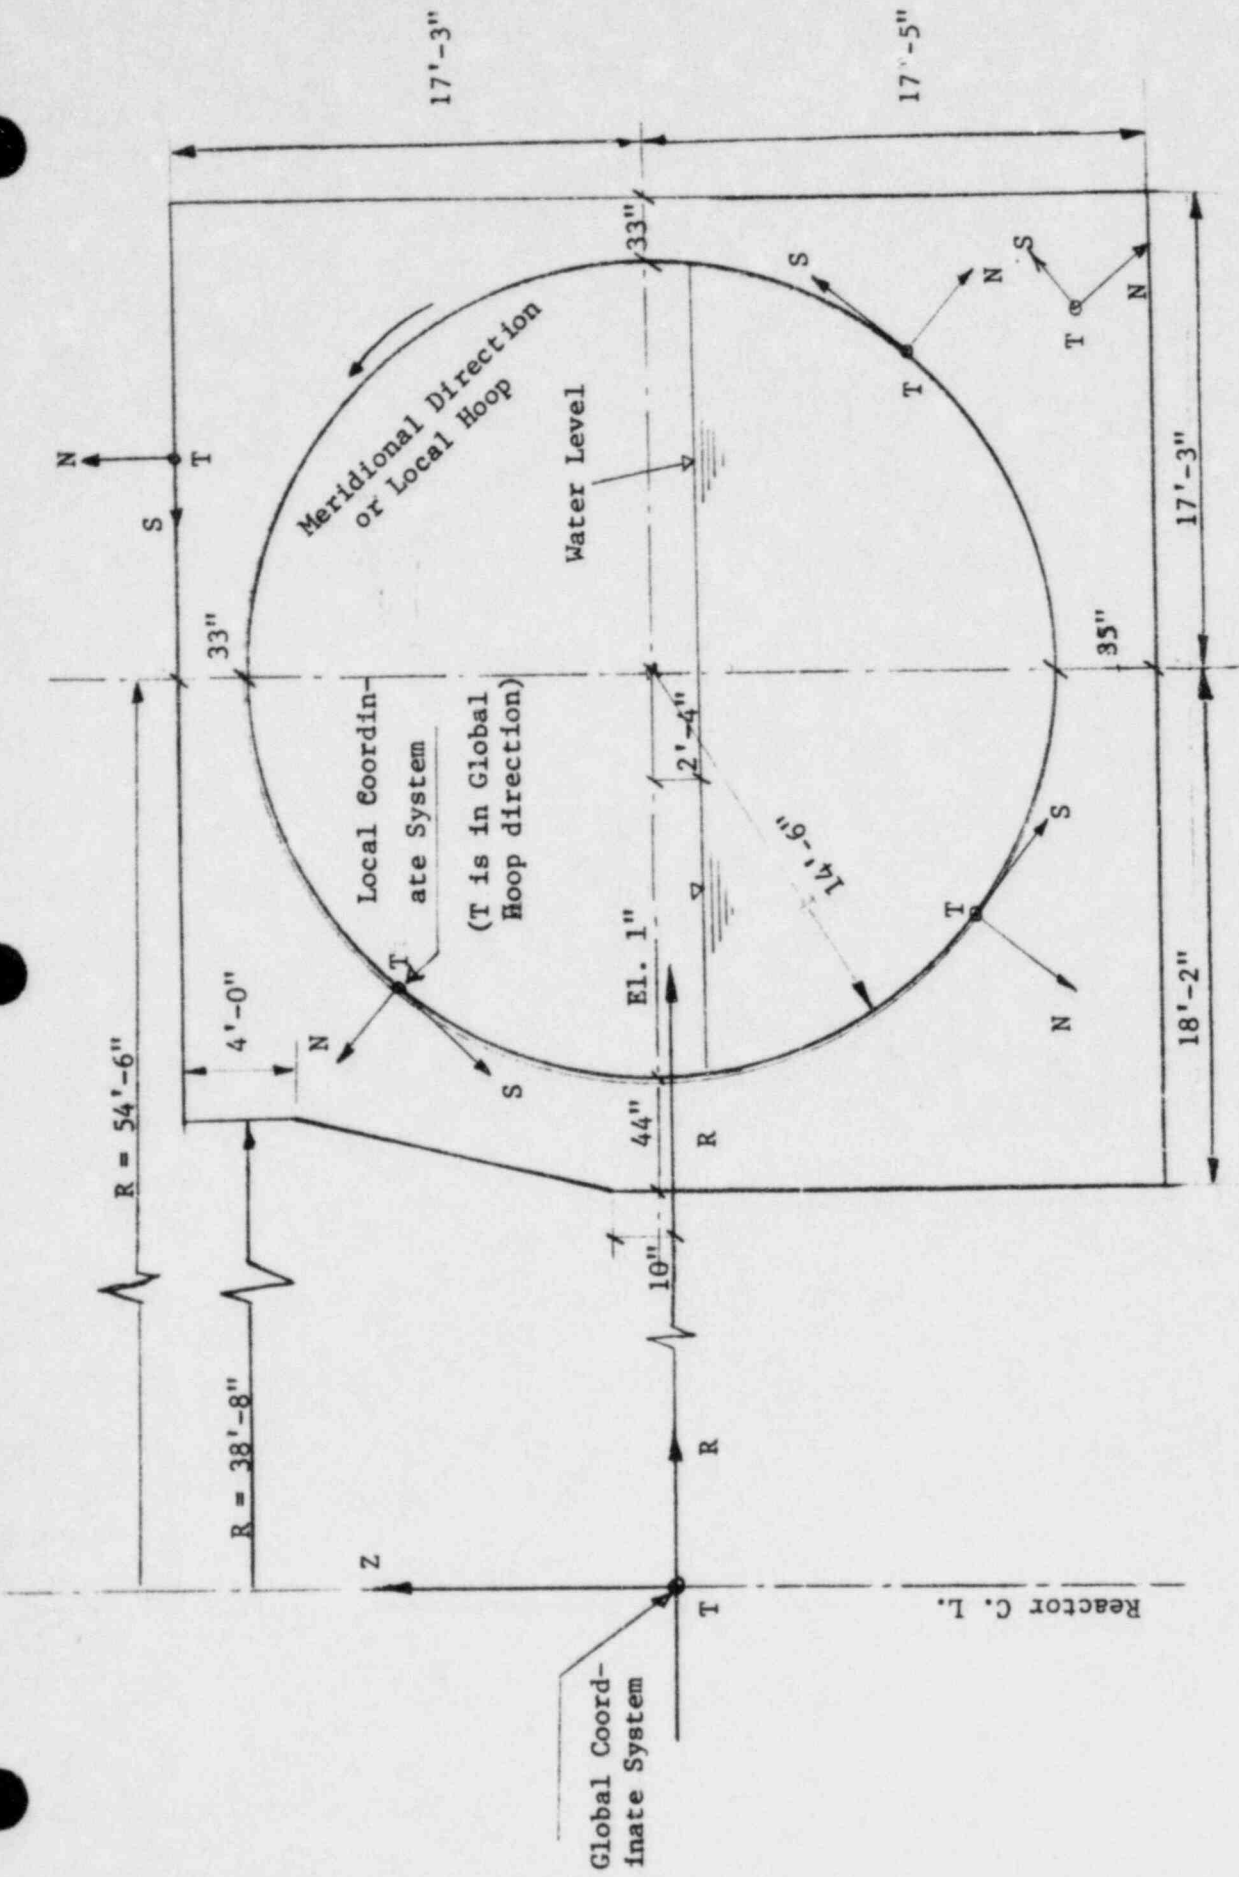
Typical Cross Section of Suppression Chamber With Local and Global Coordinate Systems
